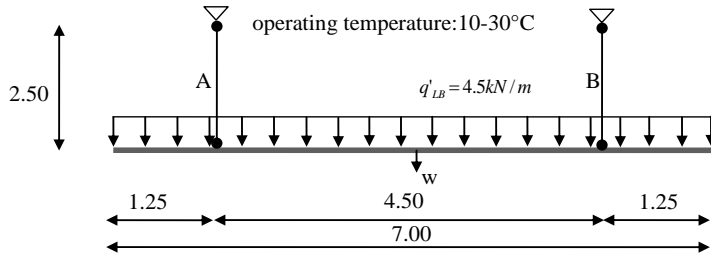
Static system and loading of longitudinal beam with hangers [m]
